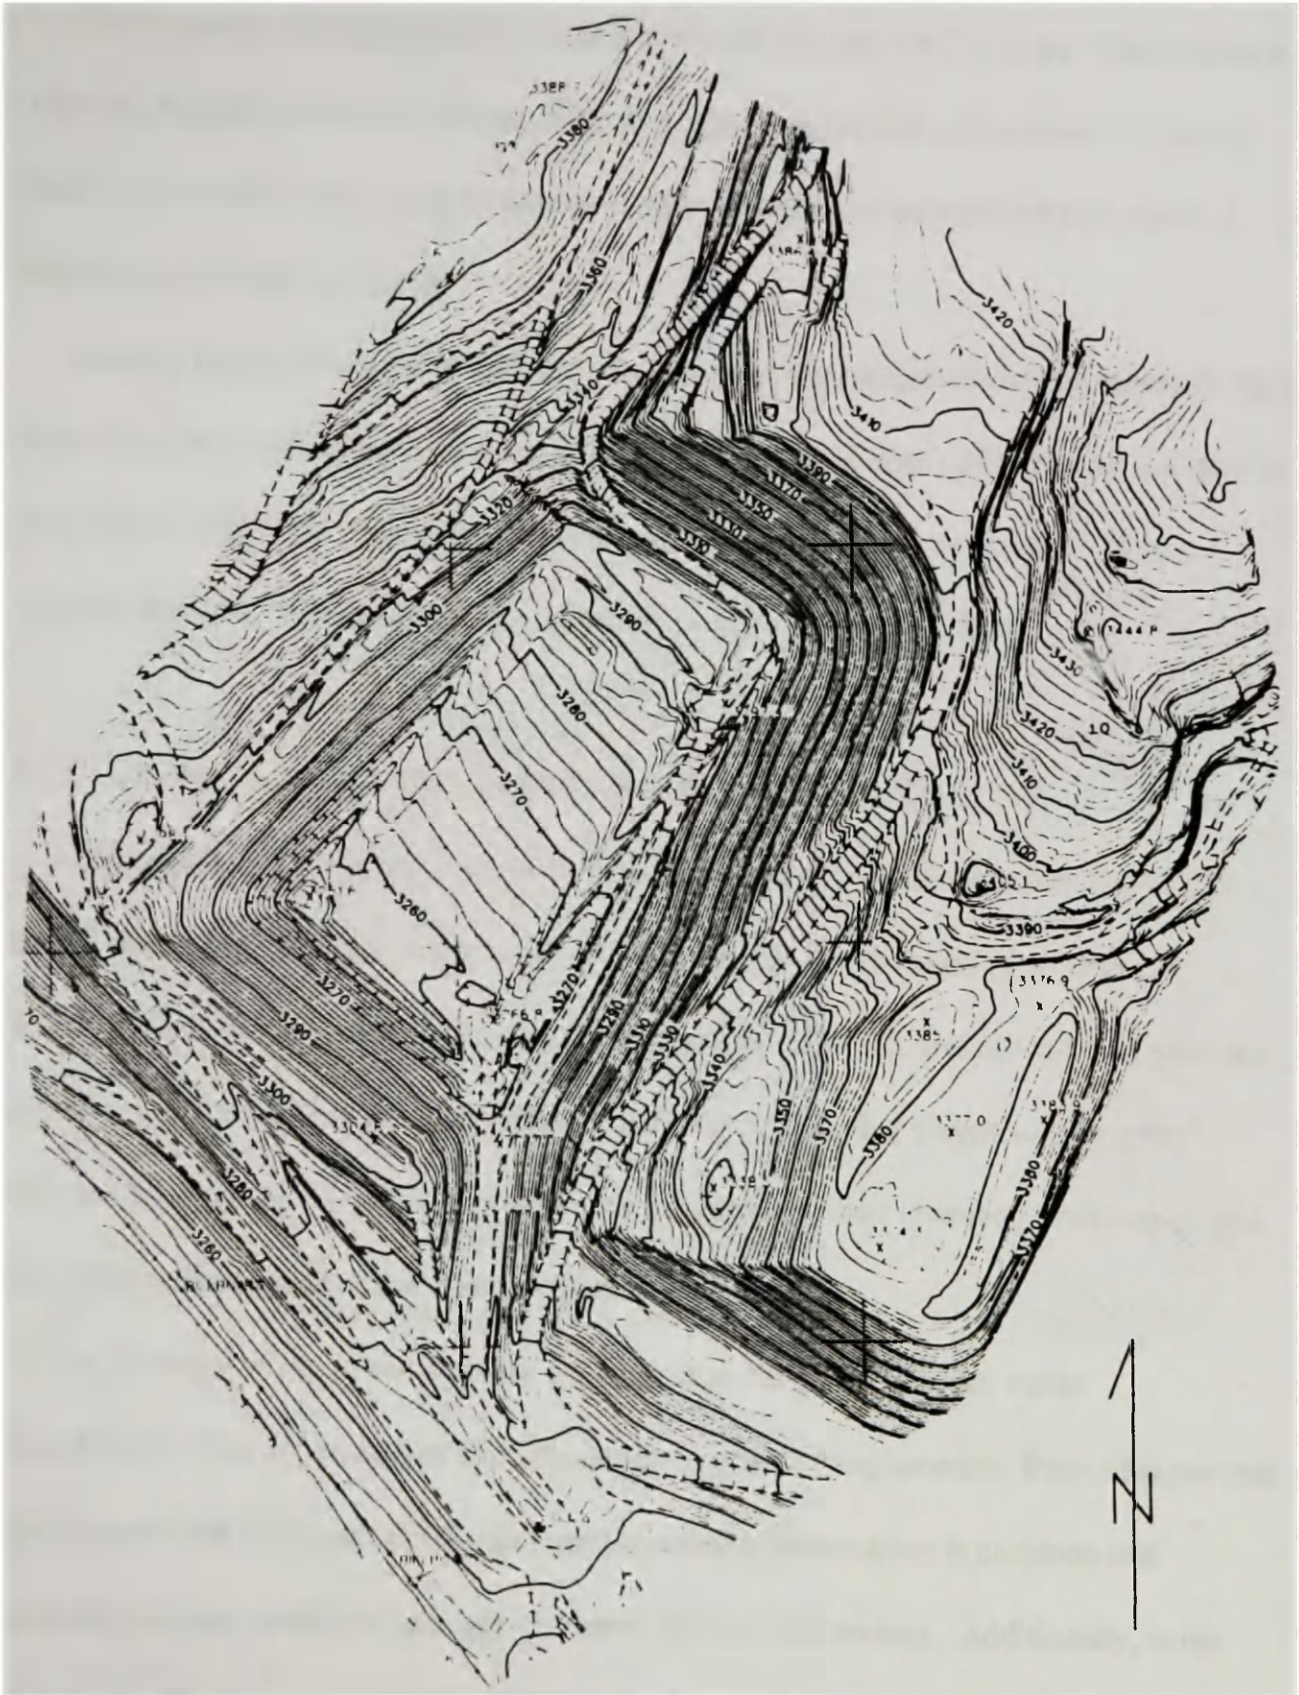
Grading plan of BFI Landfill cell (not to scale; elevations given in feet above mean sea level)
